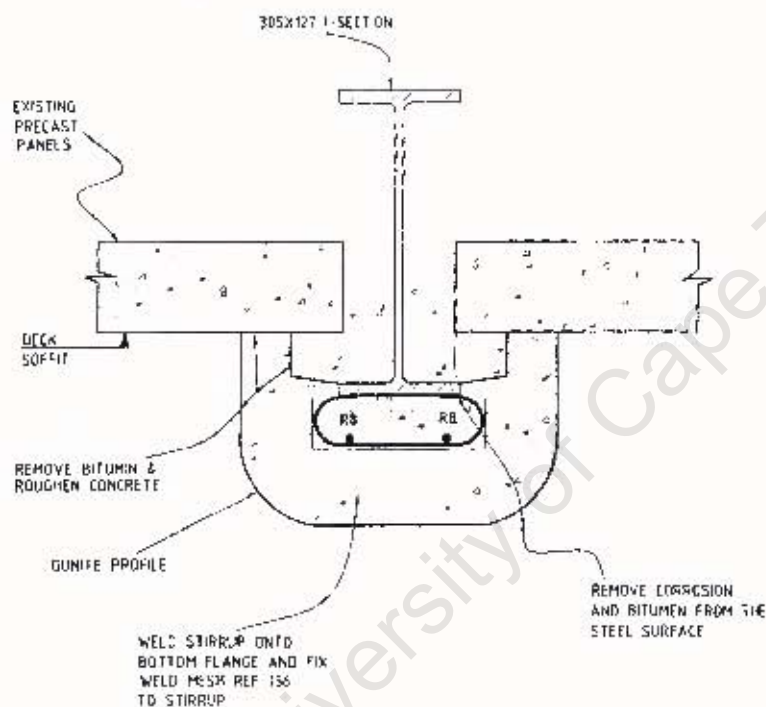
Guniting detail for Jetty 2, St Helena Bay
